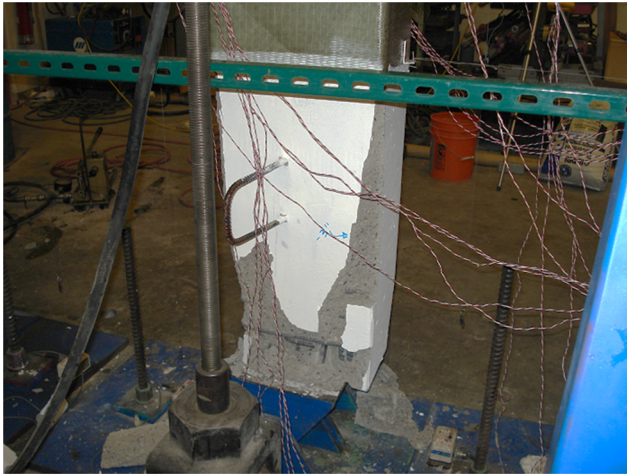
Concrete spalling at the bottom of the column at ultimate load (RS-G).
